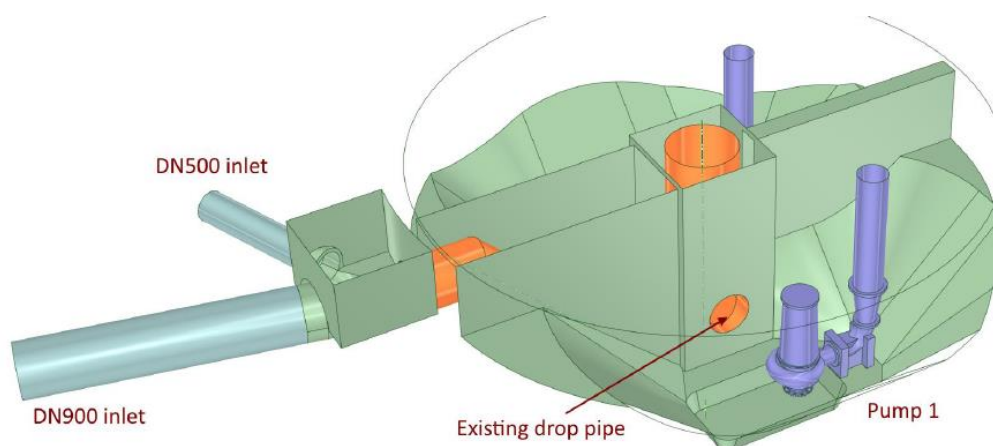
Spanns Road Pump Station Inlet - Existing
